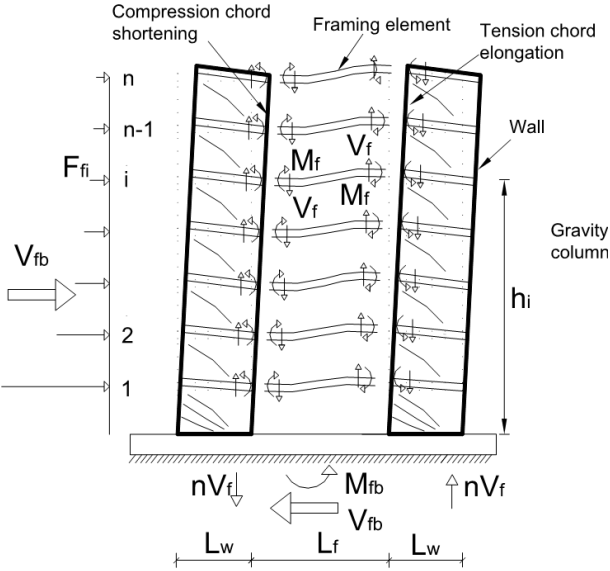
depicts a building with RC wall piers, showing a plastic hinge formation at the base of the walls. This schematic includes plastic framing actions, reactions, and variations in internal and system lateral forces.
